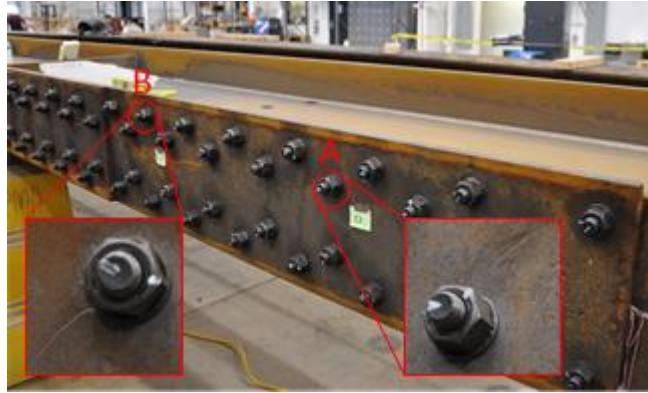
A test steel beam including 68 bolts: Two artificial cracks (locations A and B) are induced, which have similar appearance to a fatigue crack on the steel structure.
